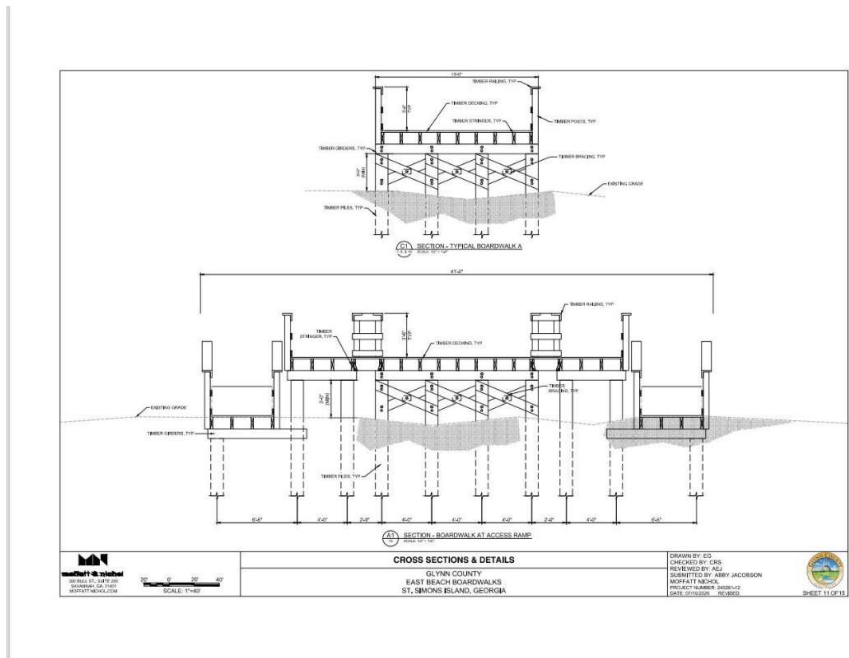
A: Typical Cross Section of Boardwalk A at access ramp.
